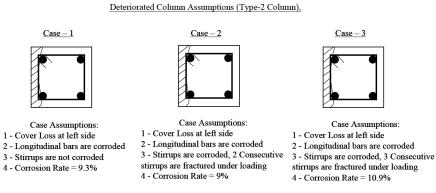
Deteriorated columns (Rodriguez et al. 2007)
